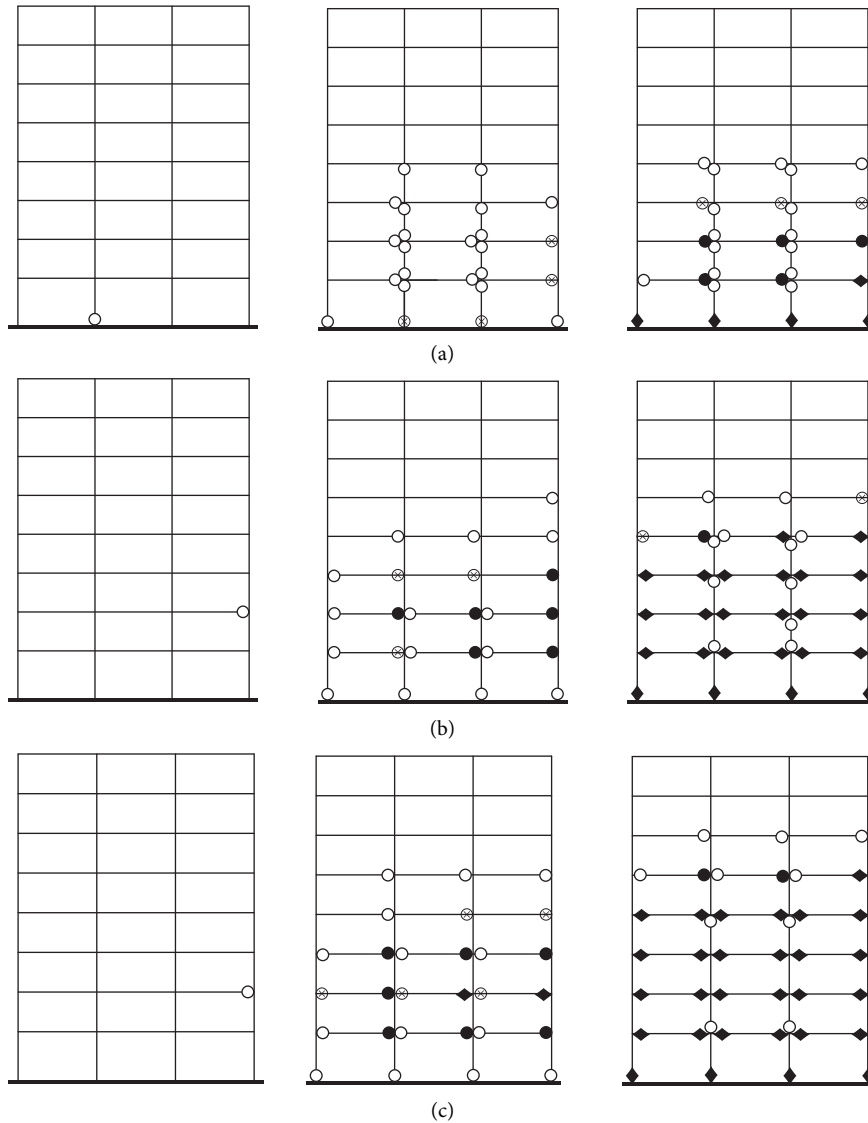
Plastic hinge development process for different failure mode. (a) Column hinge failure mode ($\eta_c = 1.0$). (b) Mixed failure mode ($\eta_c = 1.6$). (c) Beam hinge failure mode ($\eta_c = 2.0$).
